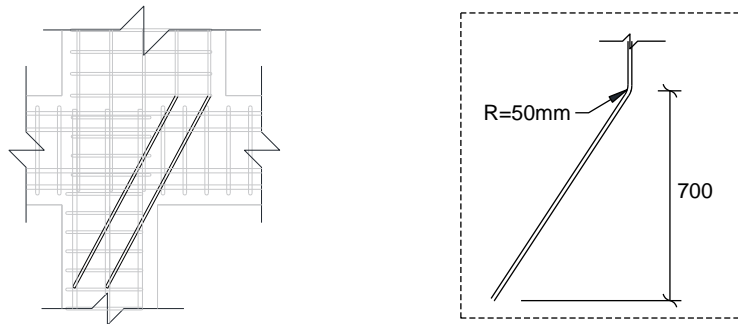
Detail of Diagonal re-bar (unit:mm)
